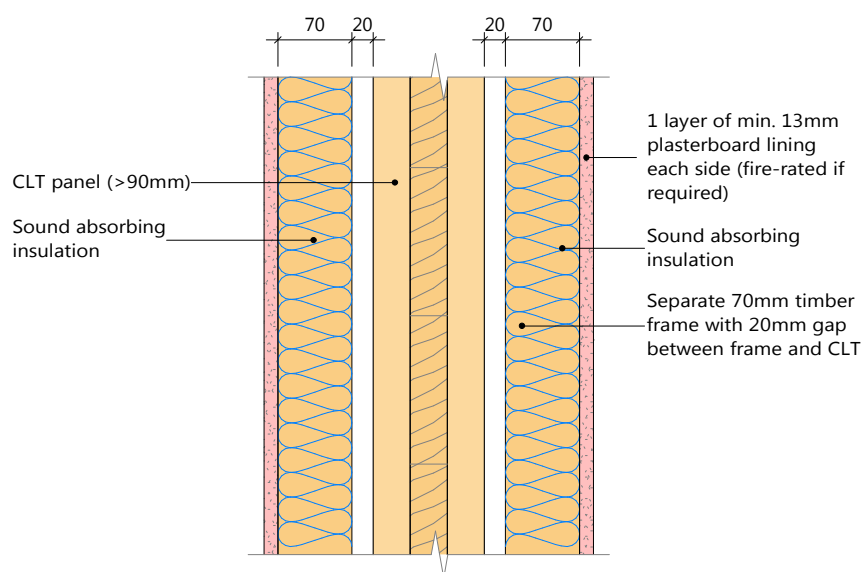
Single CLT panel wall with fire-rated linings mounted on separate timber frames.
